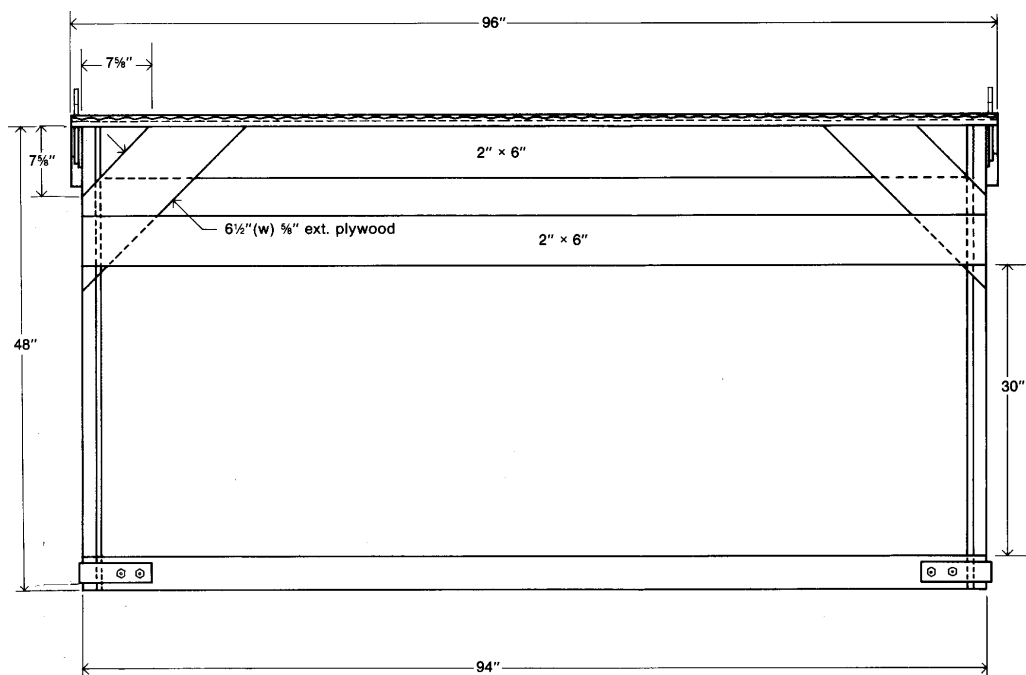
Front view construction plans for the University of Idaho calf shelter.
